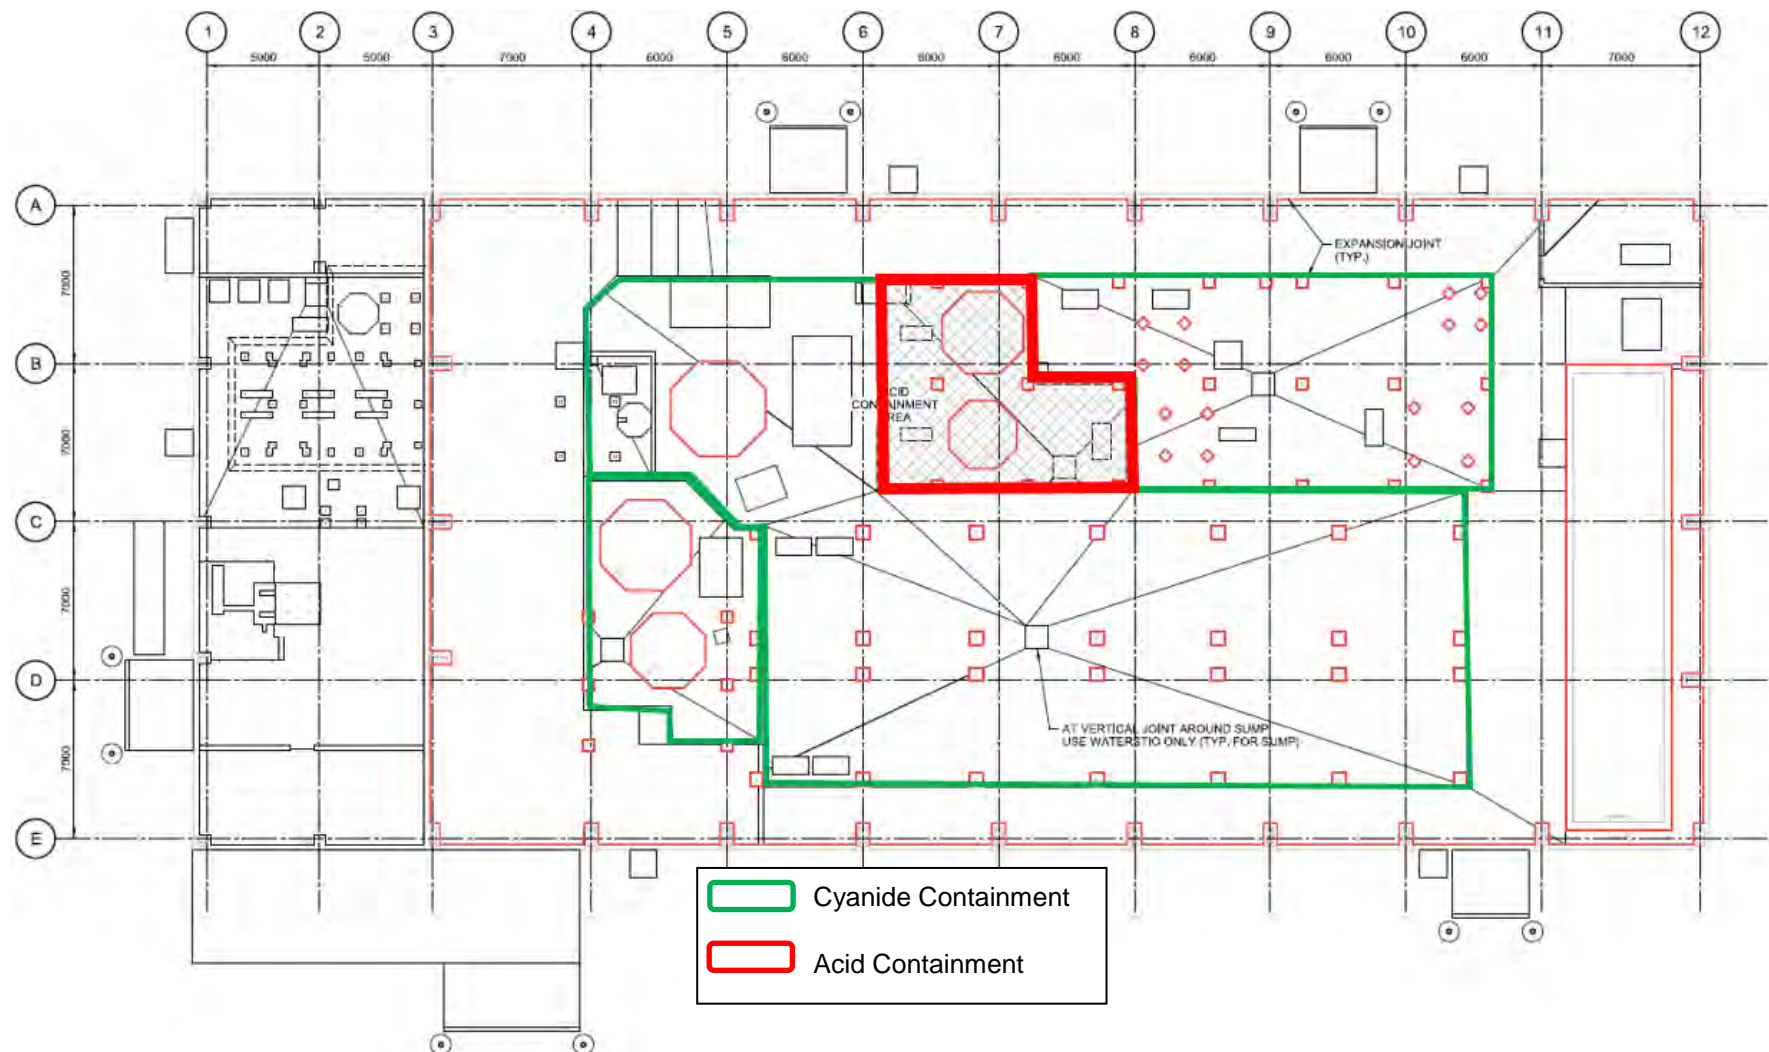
Cyanide Storage and Mixing Area Containment
